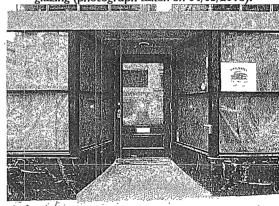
Photograph of the third bay entry from south end with angled storefront glazing system, paneled wood door, wood panel ceiling, and marble cladding (photograph taken on 01/26/2018).
